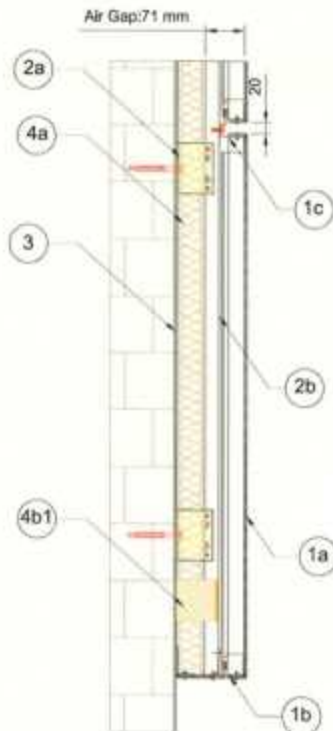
"Alucopanel® U.S.A. FR-A2" non-load-bearing exterior wall cladding vertical section detail
